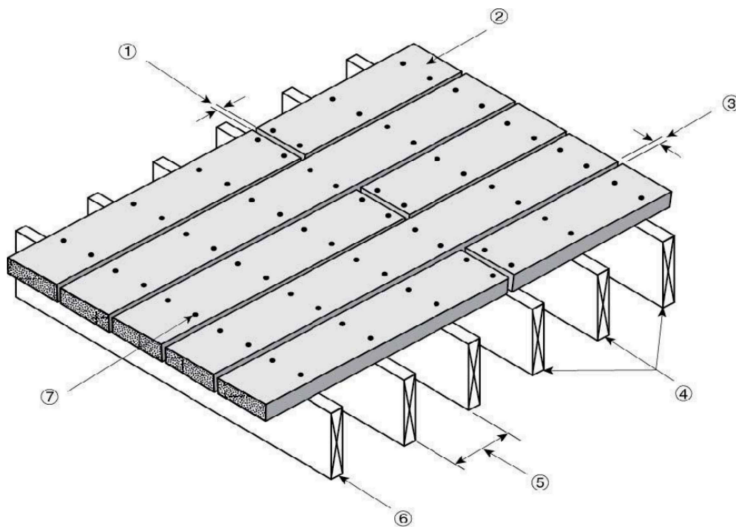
Installation details for the square edge Clubhouse® Deck products with exposed fasteners
